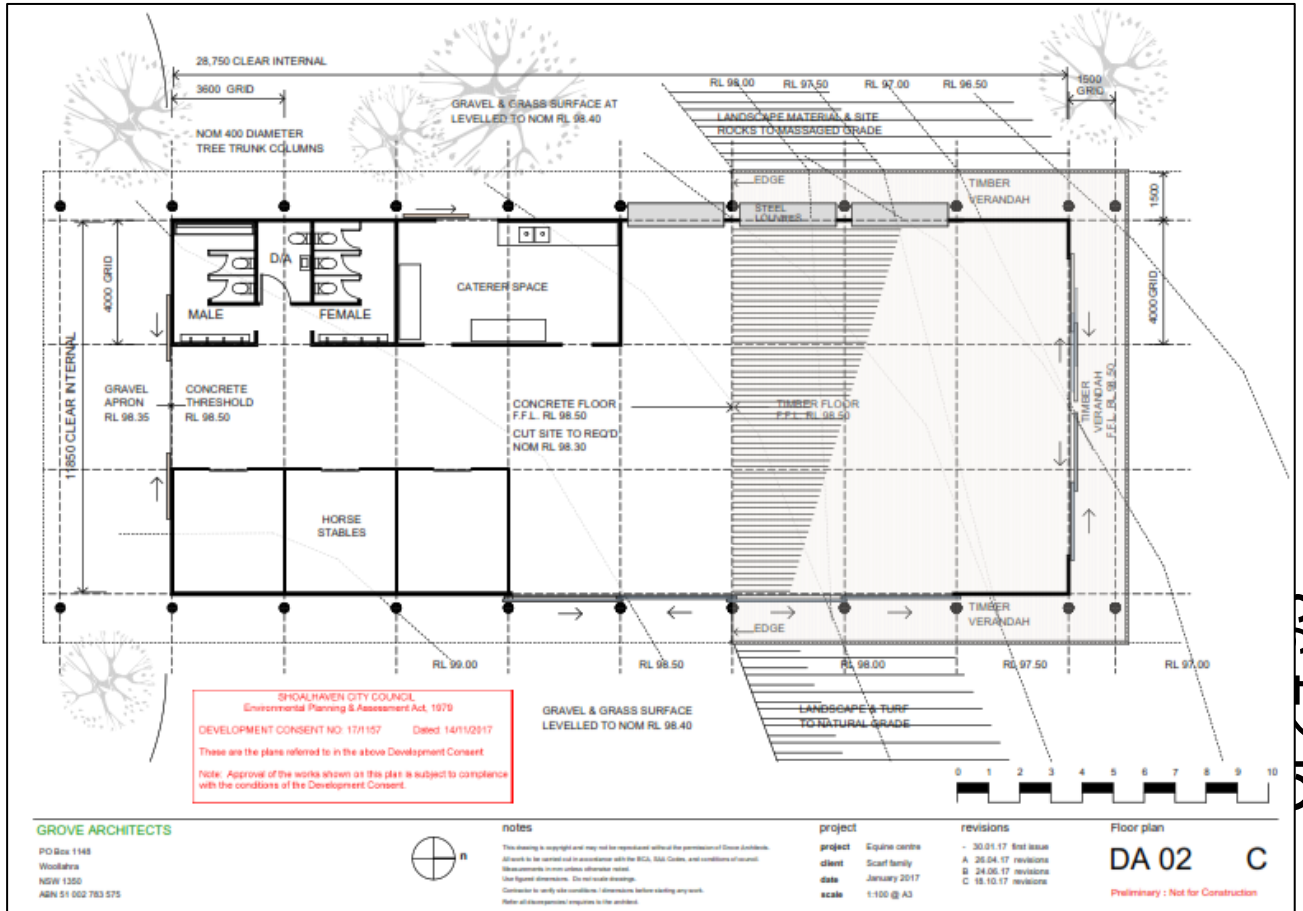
Approved floor plan of Equine Centre from DA17/1157
